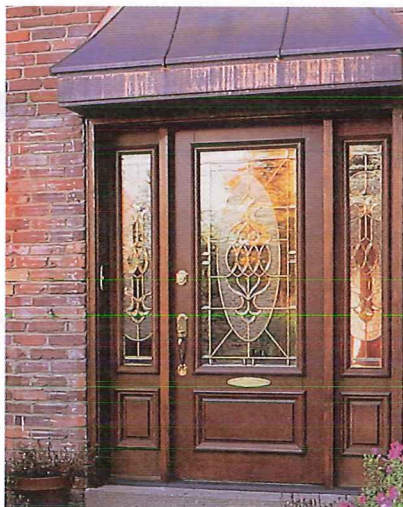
This exterior door is a flush type door. It has decorative molding to provide the look of a panel door and includes an attractive leaded-glass light. (Peachtree Doors, Inc.)
